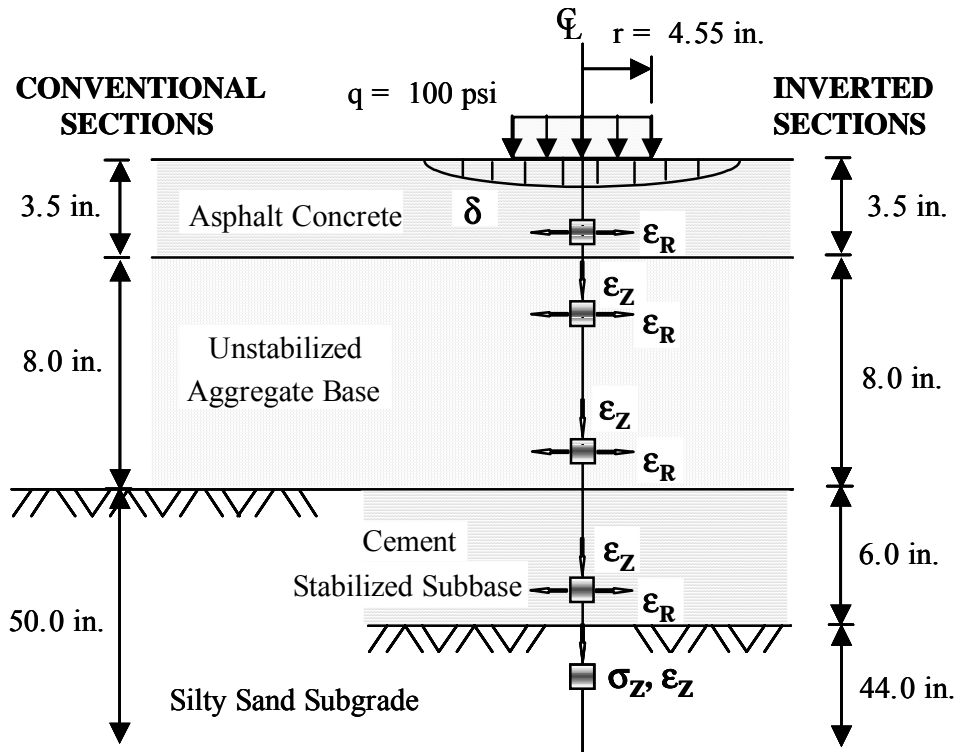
Typical Cross Sections of GA Tech Pavement Test Sections
